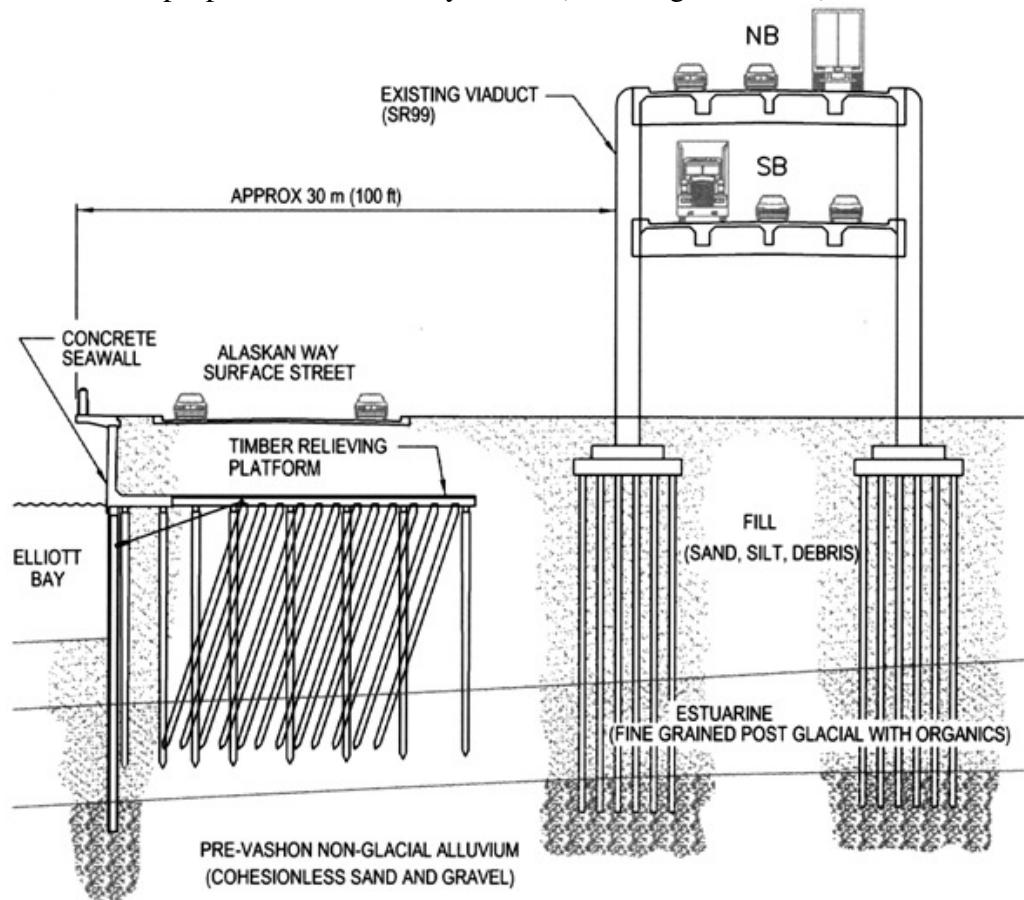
Typical Cross-Section of AWW and Seattle Seawall [Kirandag et al. 2007]
